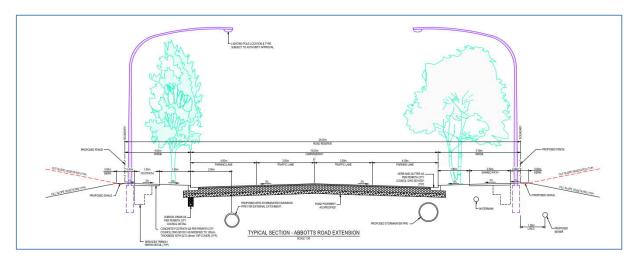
Typical section of the proposed Estate Road (Abbotts Road extension)
